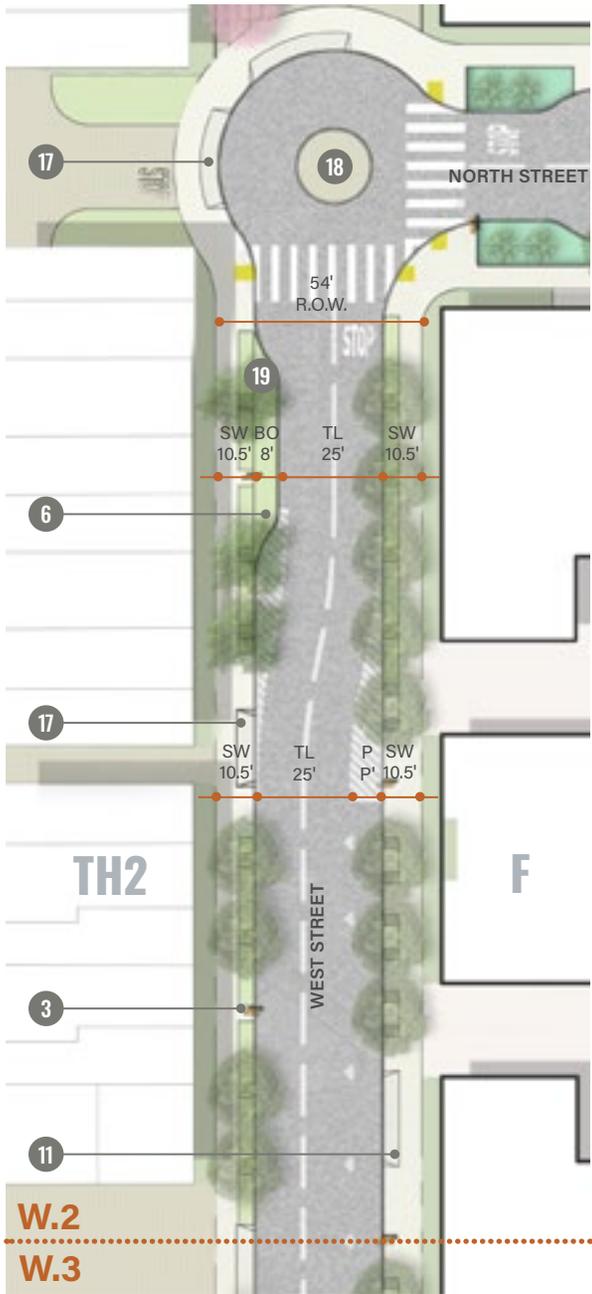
West Street, Site Plan W.2 & W.3
